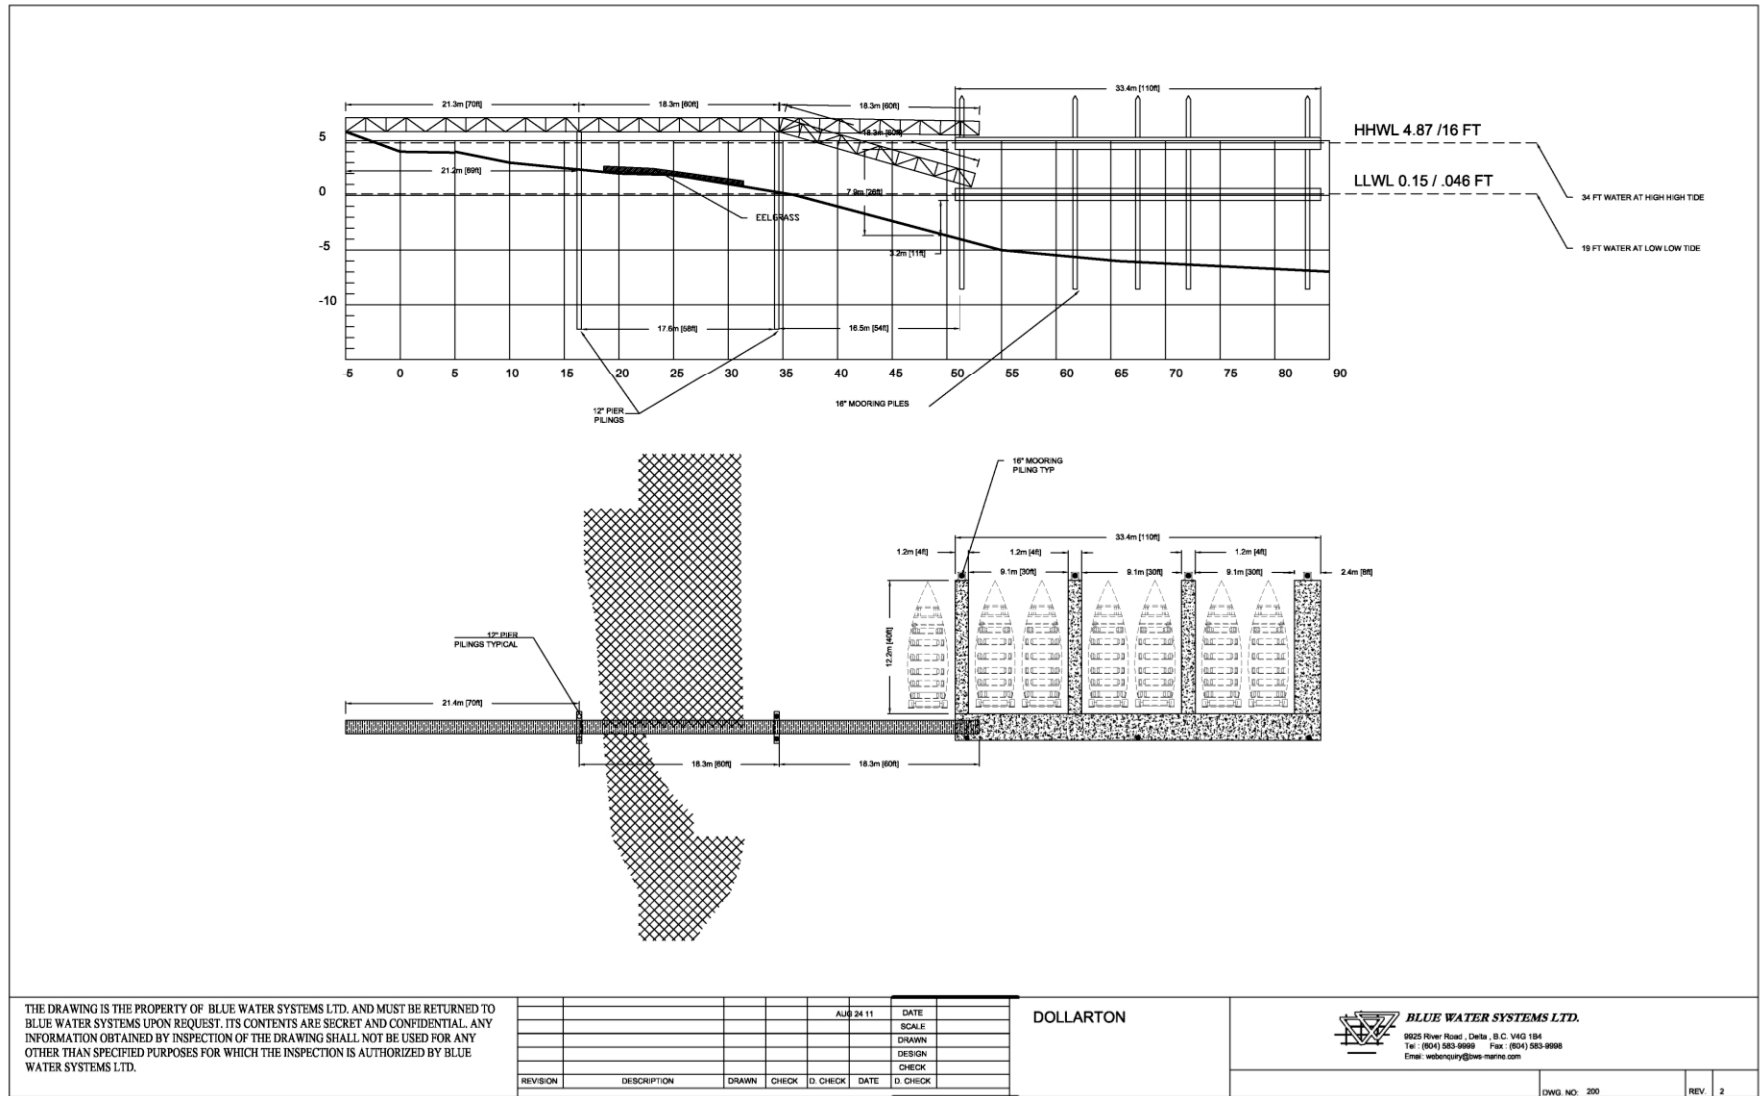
Plan of the proposed dock at 3707 Dollarton Highway, North Vancouver.
